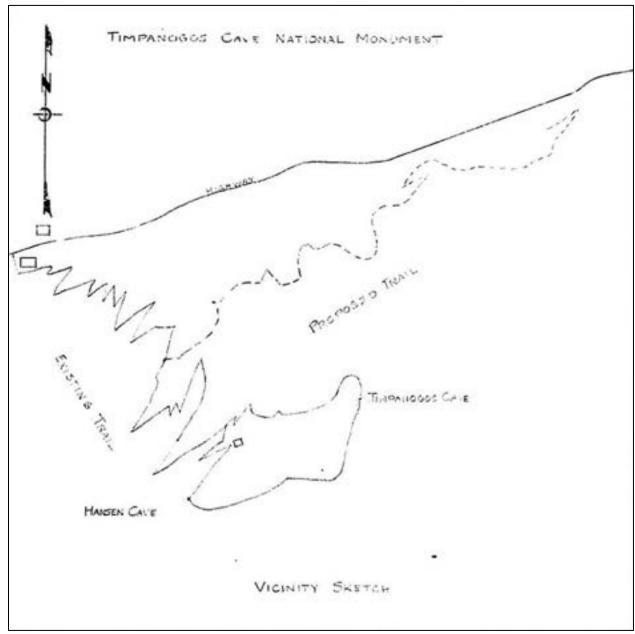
Detail from Trail Relocation plan showing modifications to Cave Access Trail alignment (NPS 1940).
